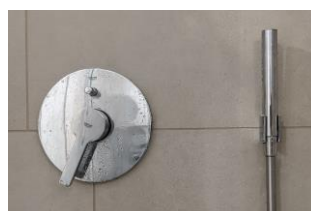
Shower Valve Handle and Hand Shower Holder (Image Roser)
